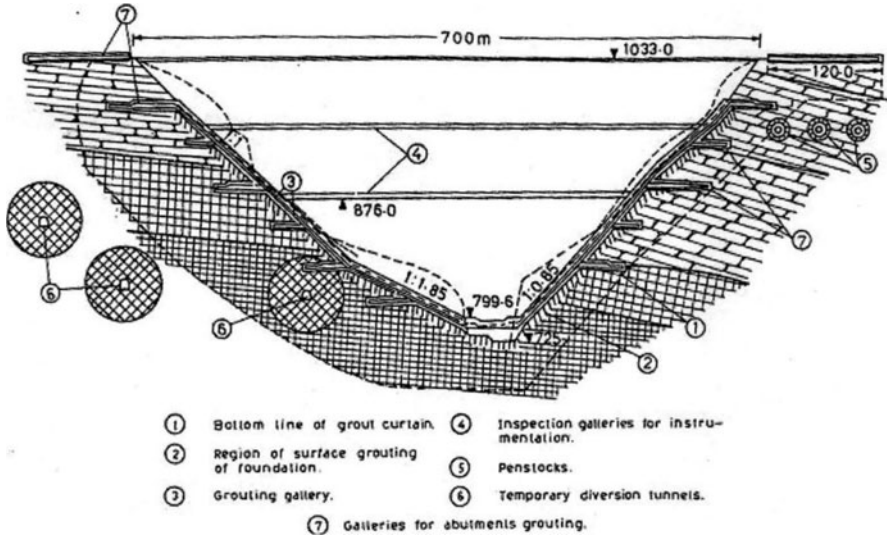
Longitudinal section along the abutment grouting galleries of Nurek dam.
